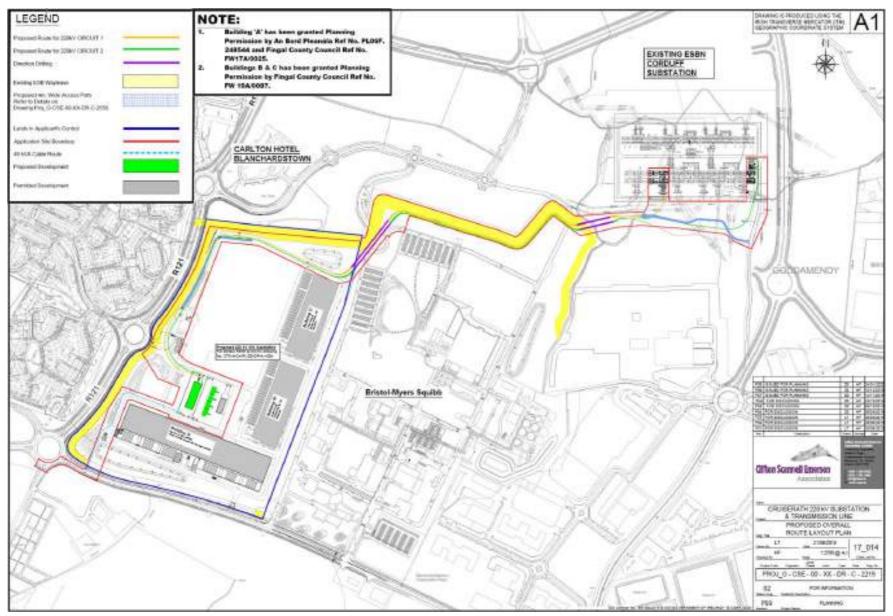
Proposed site layout plan illustrating red line boundary (Source: Clifton Scannell Emerson Associates, January 2020)
